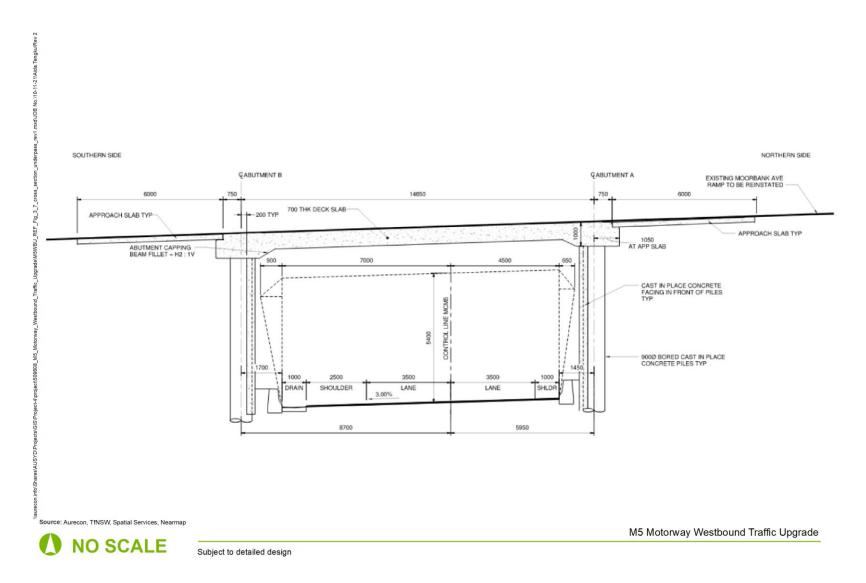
Cross section of the underpass under Moorebank Avenue
